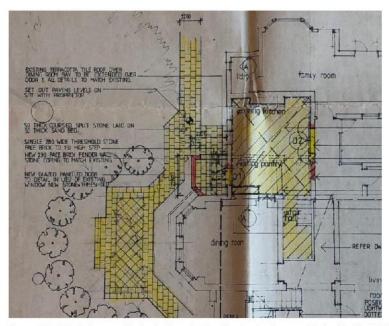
Extract from architectural plans for the Fleming family associated with BA 237-91 showing the proposed and subsequently approved works to demolish the existing dividing wall between kitchen and pantry in favour of the construction of a new bricked pantry to the western elevation of the dwelling (Source: Burwood Council archives).
